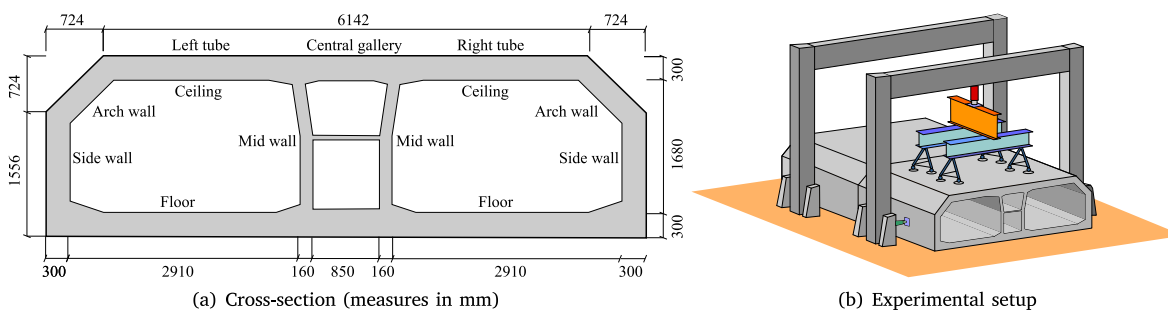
Cross-section and setup of the tunnel segment fire test.
